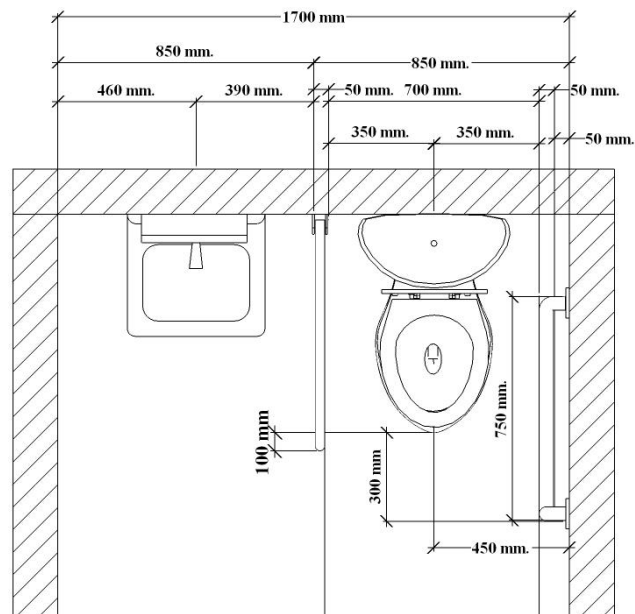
BLOW UP FLOOR PLAN OF ACCESSIBLE TOILET FOR PESONS WITH DISABILITIES
